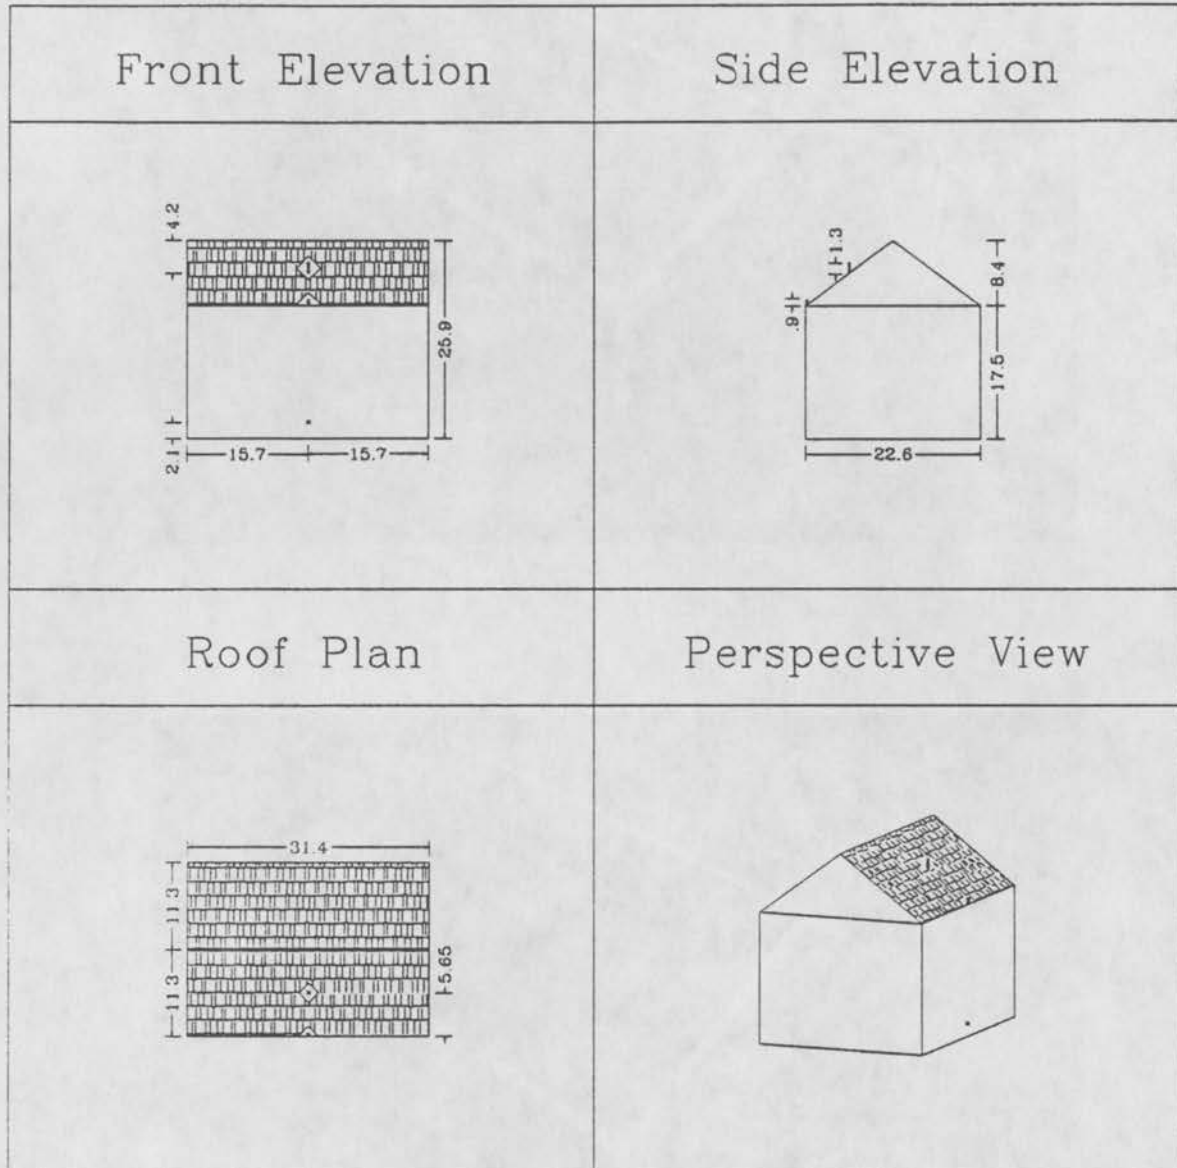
Two Story House with 6:12 Roof Slope Dimensional Drawing
